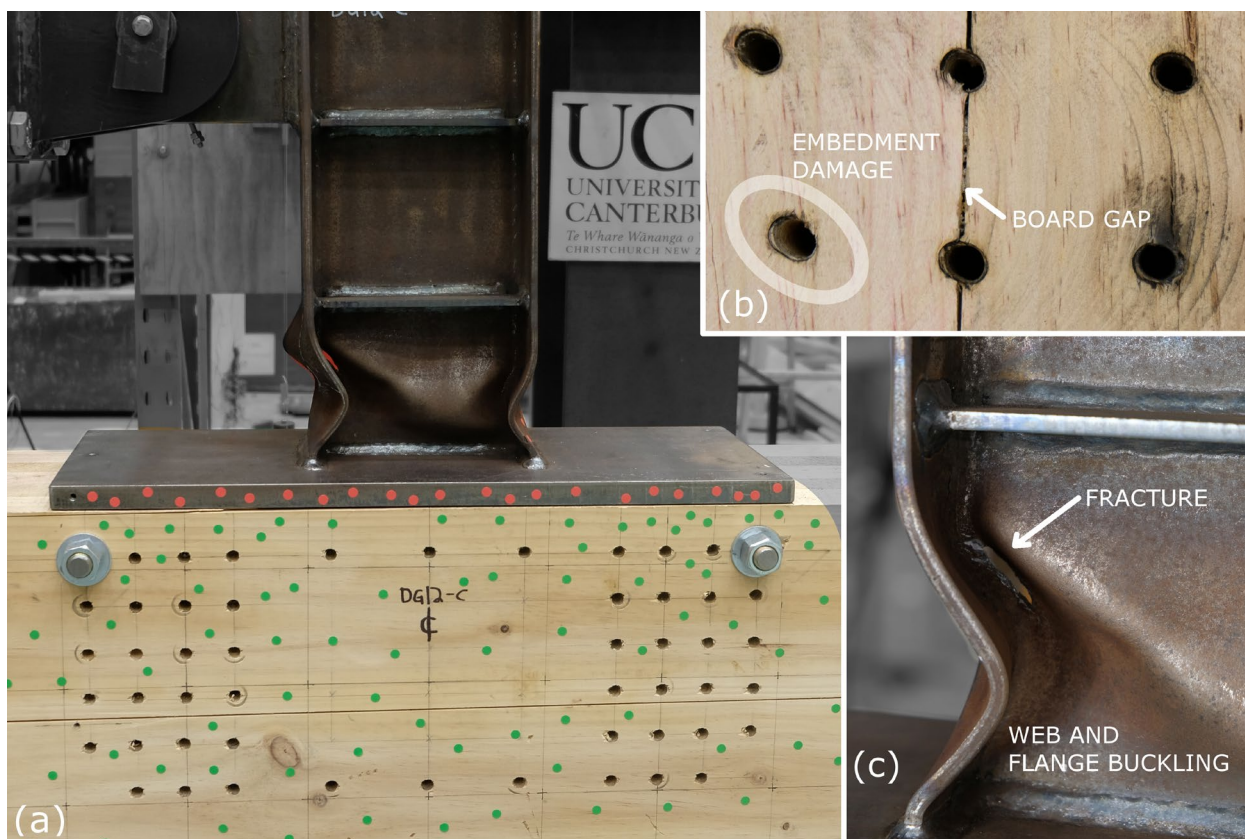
Damage to steel beam flange and web (a, c) and absence of damage to self-drilling dowels (b).
